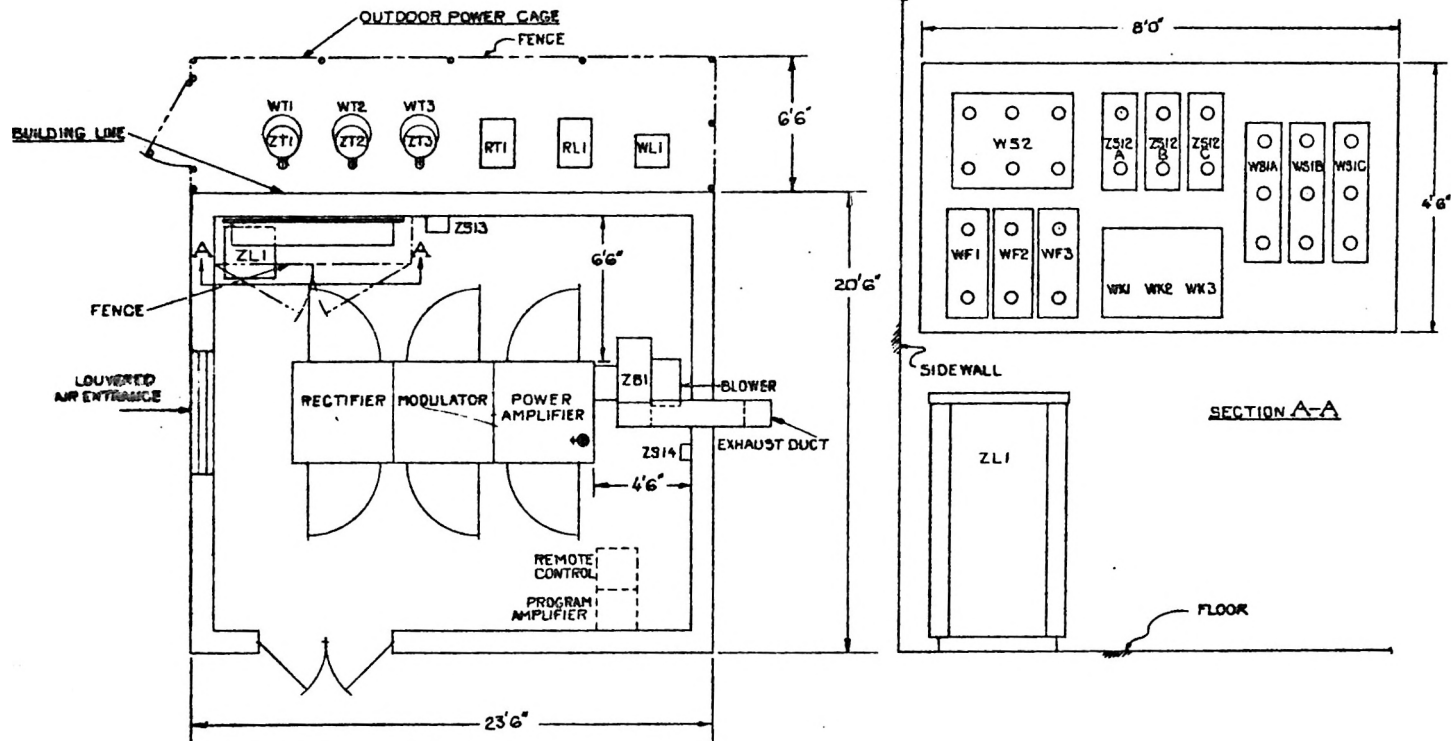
Typical Station Layout for 2400/4160-Volt Operation (D-7669896, Sheet 2)
